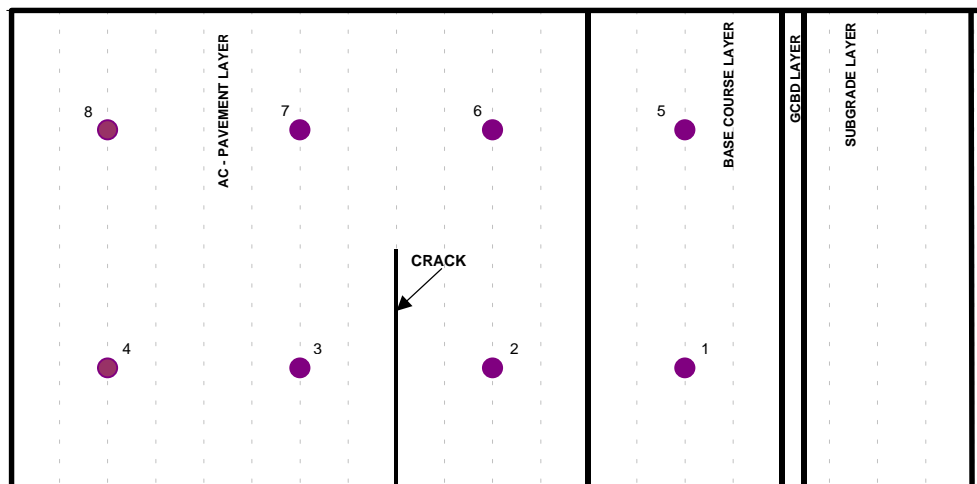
Plan view of the GCB D test section showing instrumentation layout.
